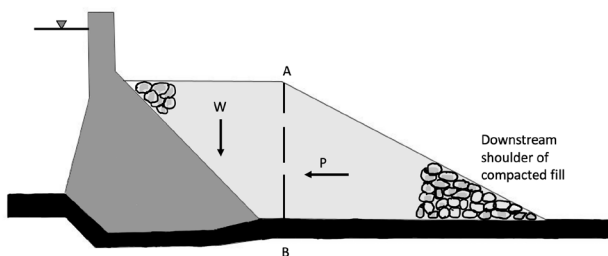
Additional forces imposed on a dam through the addition of a rockfill shoulder downstream (adapted from Novak et al. (2004))
